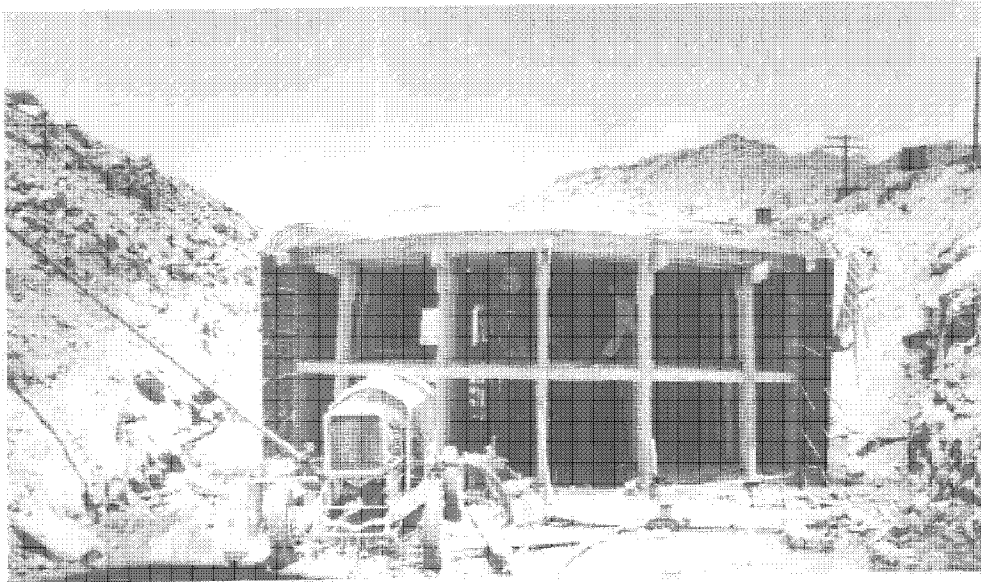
Forms for Roof of Closed Conduit "B" in Place, 29 July 1937.
